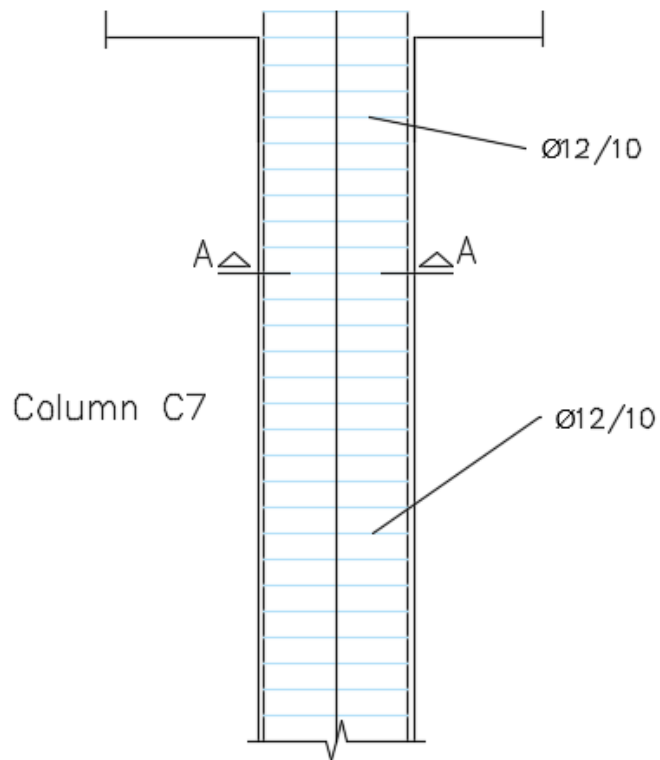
Column C7, C3 and C6 Shear Reinforcement Detailing
